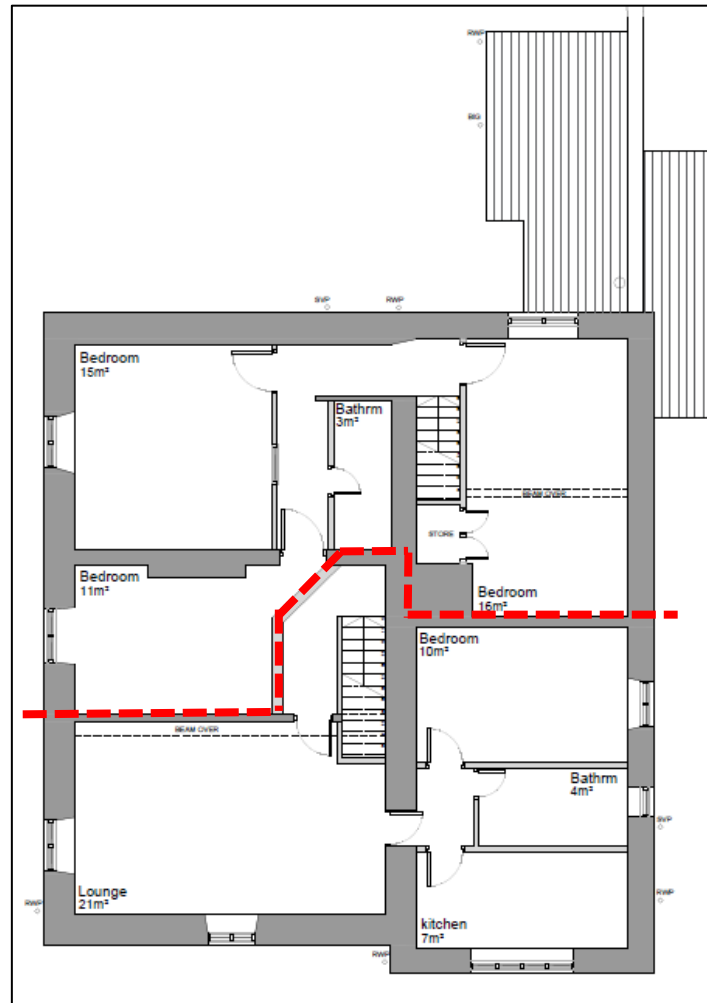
First floor plan of 8-10 Shawbridge Street (red dotted lines show the division between No. 8 and 10)
